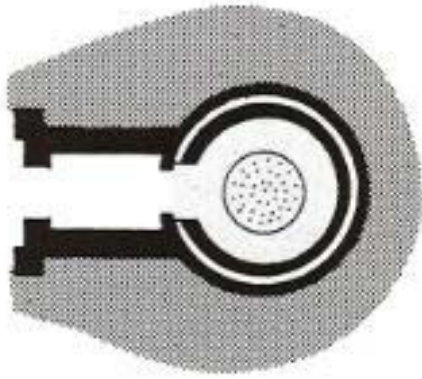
Plan of an icehouse to be built at Military College in 1815 with a perforated stone over the sump
